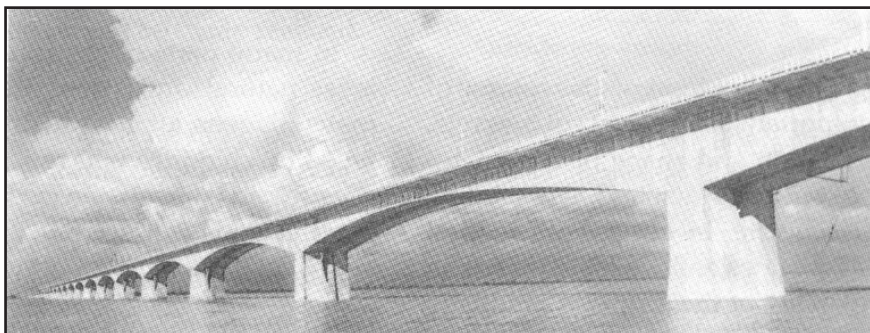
Ganga bridge at Patna — 5575-m long, one of the longest river bridges in the world.
